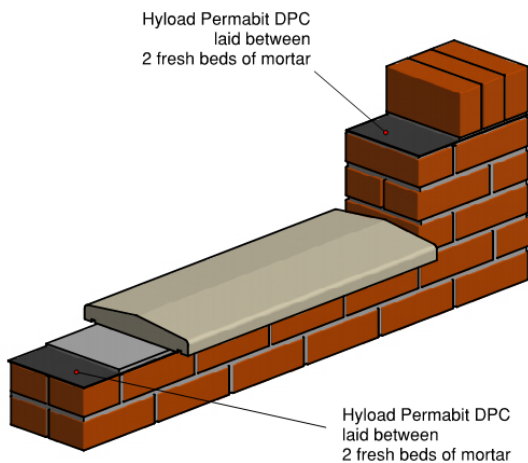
Coping Stones and Brick-on-Edge Detailing
